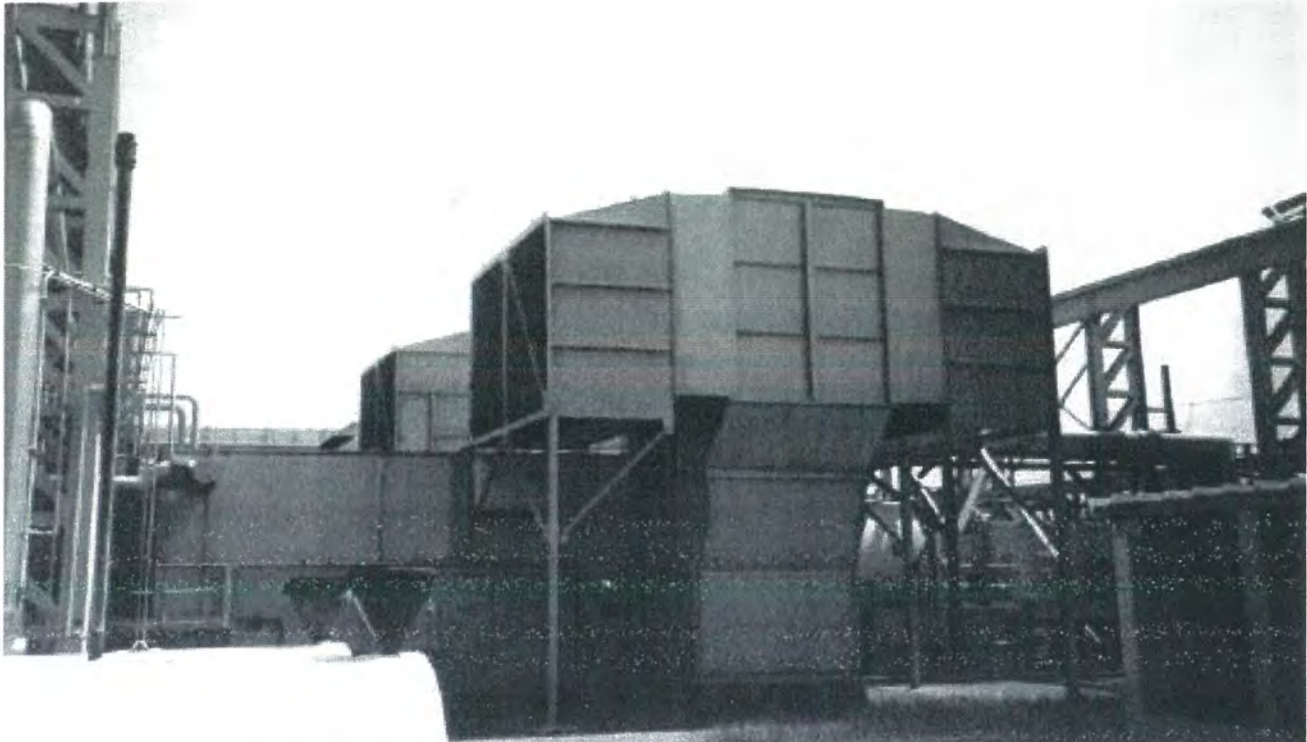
Inlet duct of the combustion turbine after modifications to add weather hoods.
